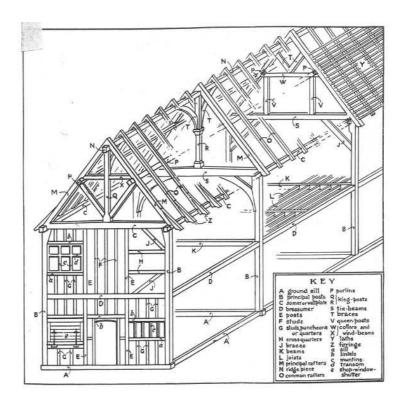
'Diagram of the construction of a timber-framed house' (Salzman, *Building in England Down to 1540*, p. 198).
